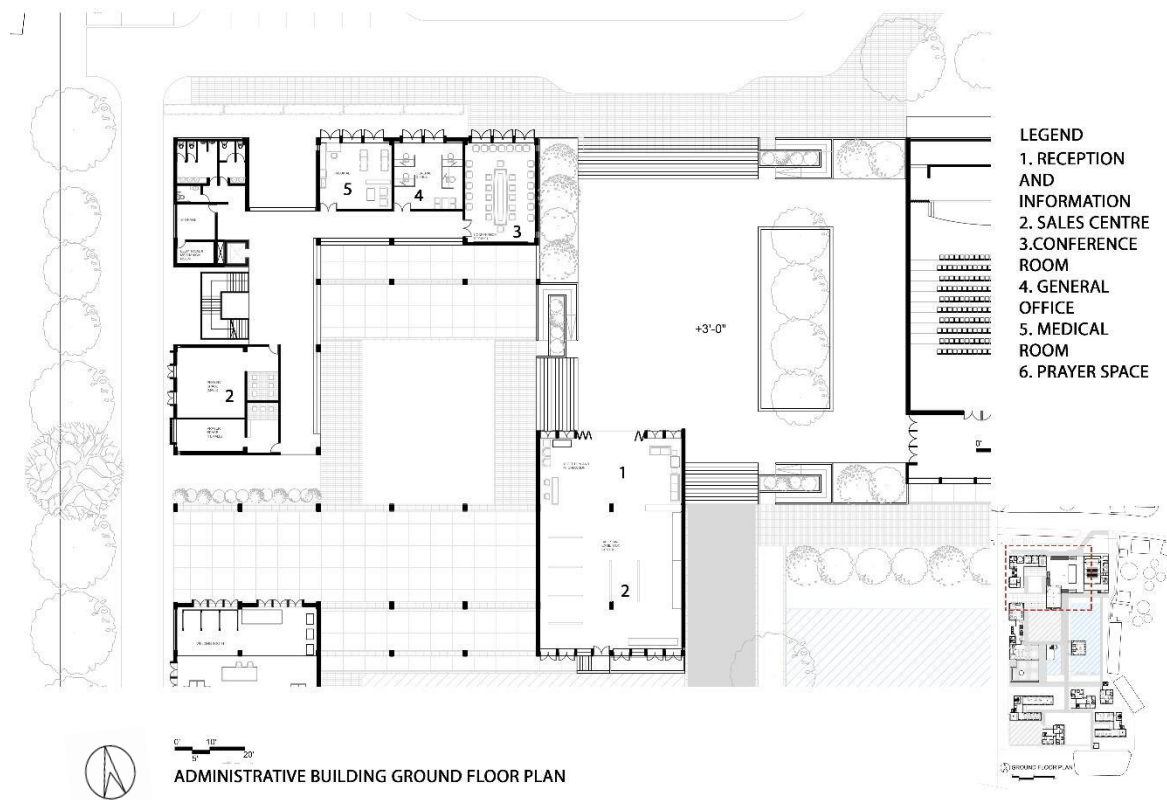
Administrative building floor plan blow ups (Source: Author)
